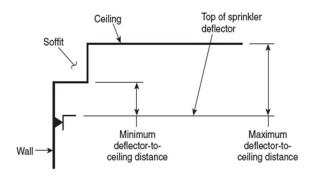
Location Sidewalls with Respect to Soffits — Sidewall Under Soffit.
